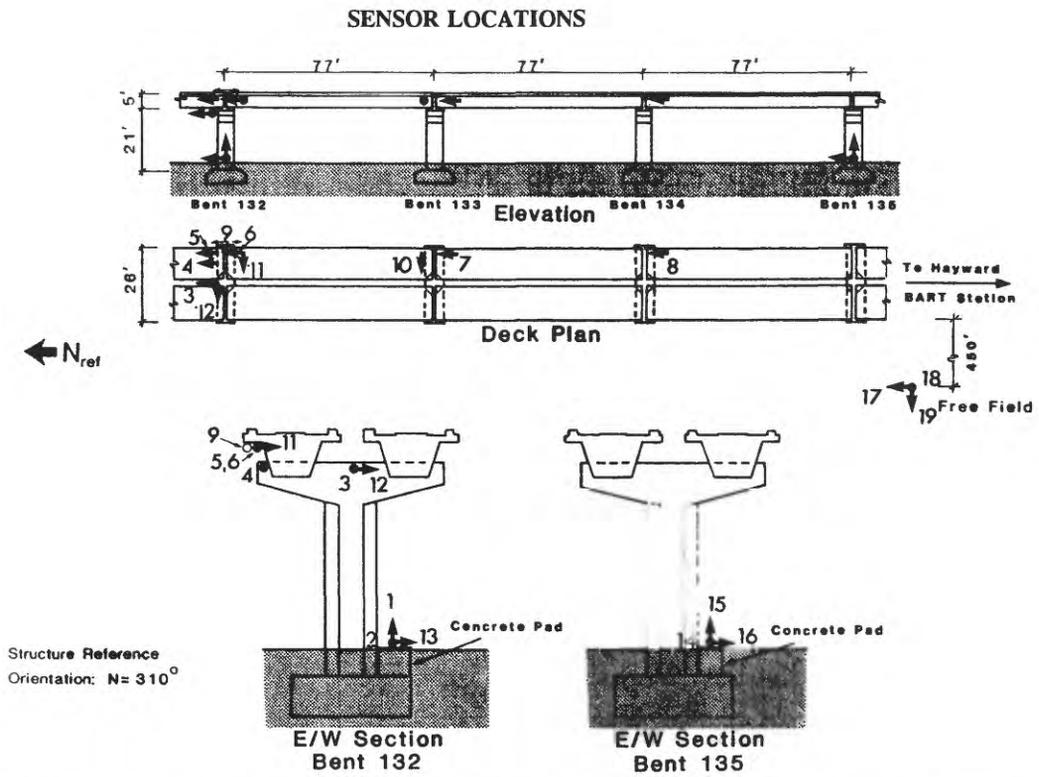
Plan, elevation, typical section, and instrumentation for Hayward BART Viaduct (courtesy of California Strong Motion Instrumentation Program).
